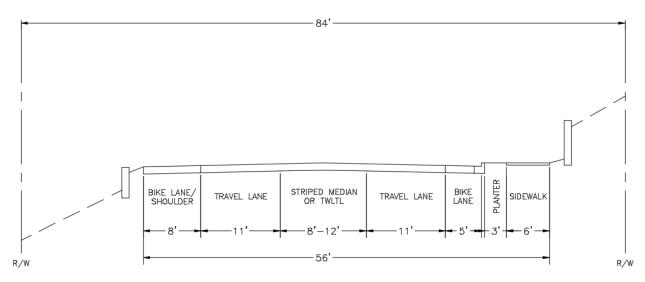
Three-Lane base design proposed cross section (in Sammamish, facing south)
